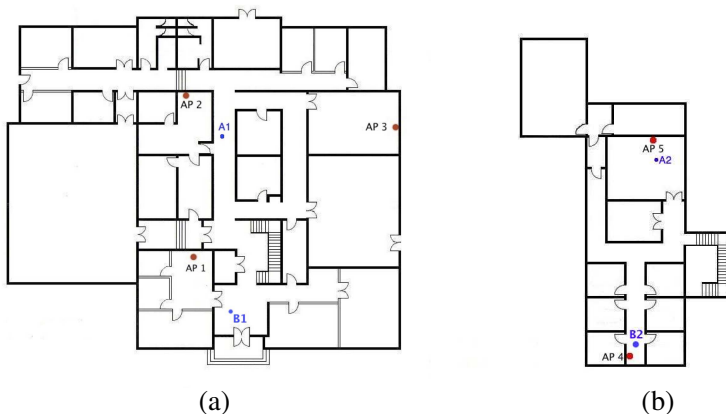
Two floor plans showing (a) three APs in first floor and (b) two APs in the second floor.
